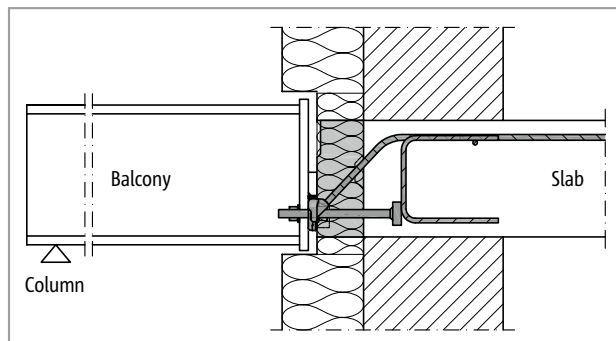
Schöck Isokorb® T type SQ: Connection to reinforced concrete inner slab; insulating element within the core insulation zone.
